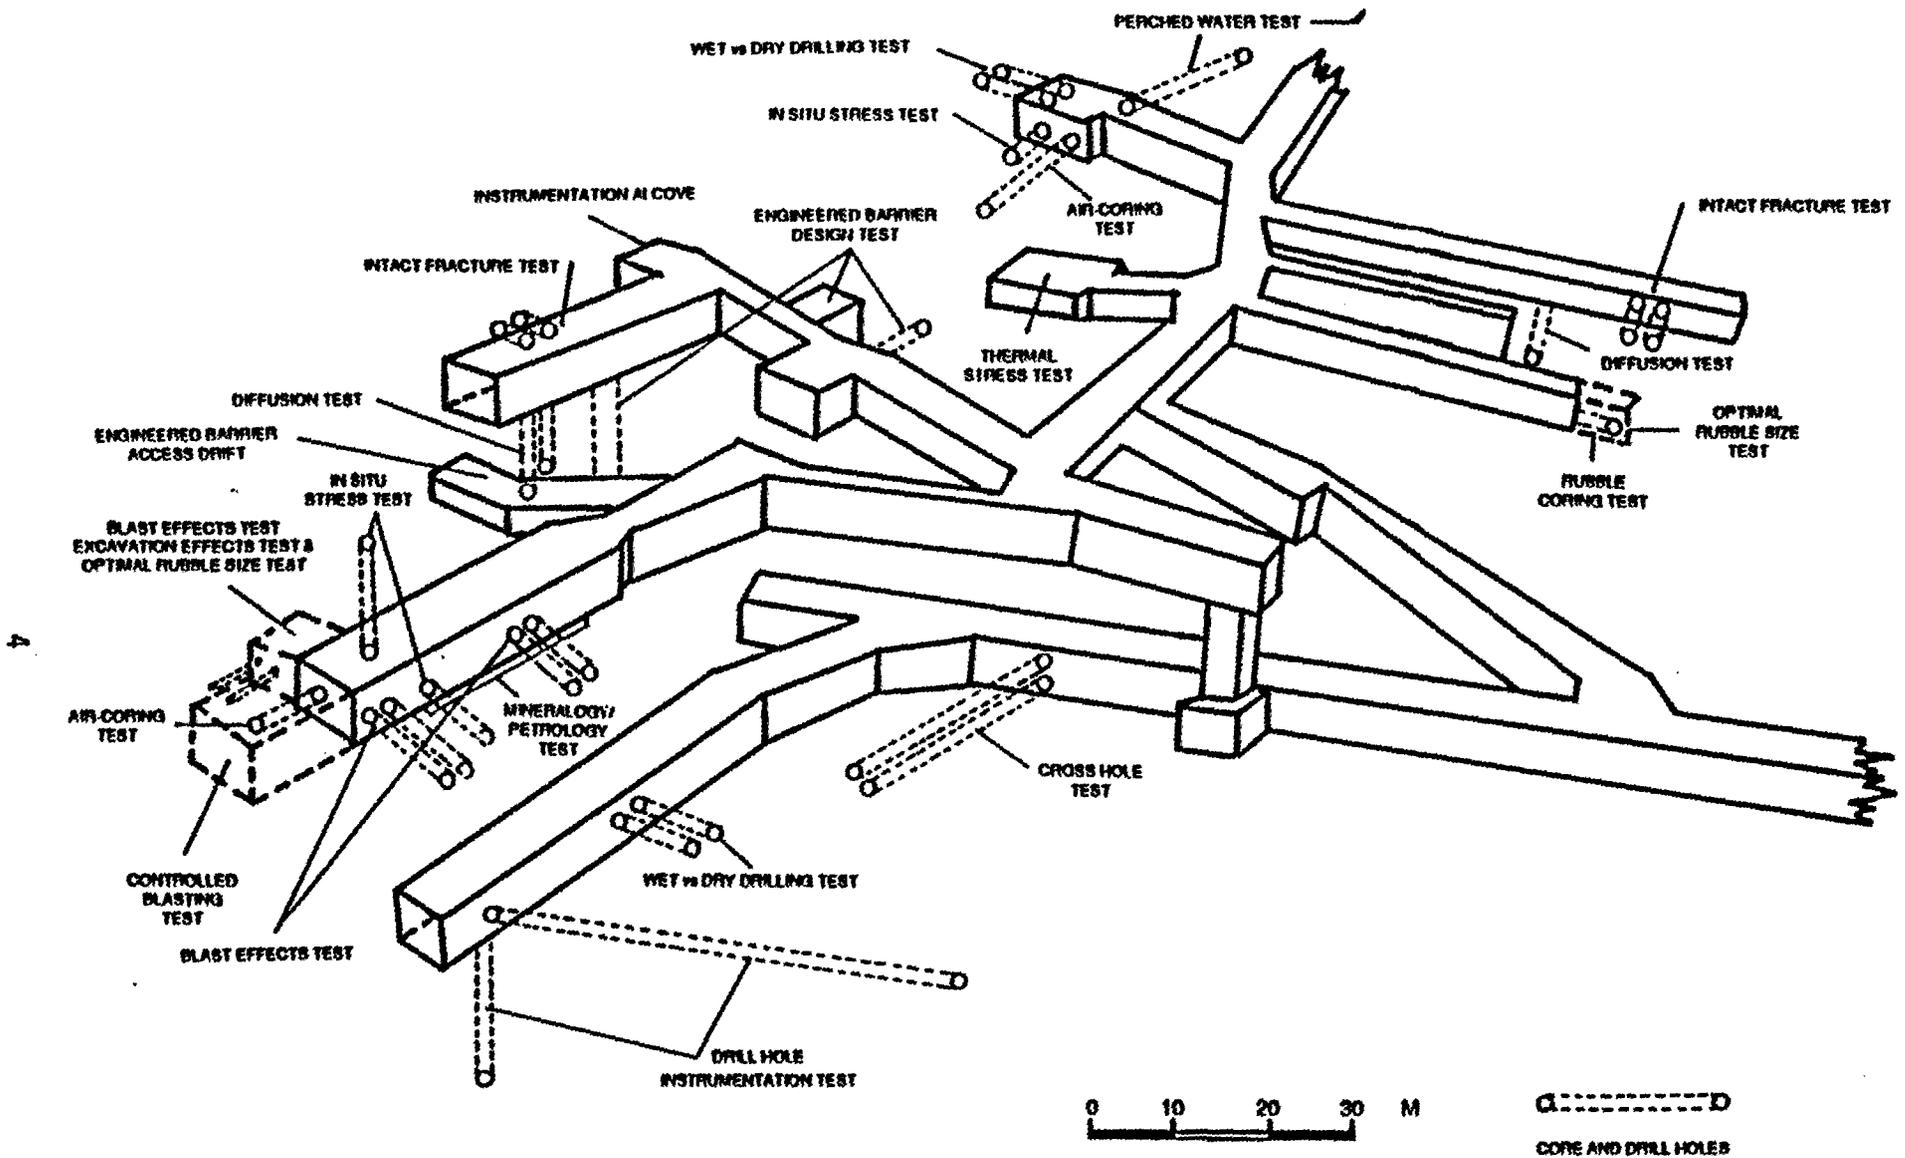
G-Tunnel Underground Facility showing locations of prototype tests
